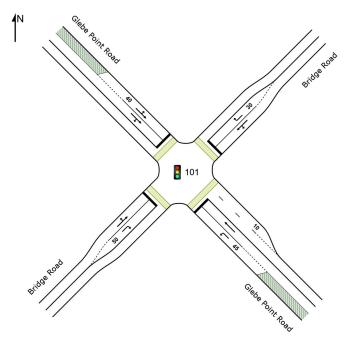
Existing Layout of Bridge Road and Glebe Point Road
